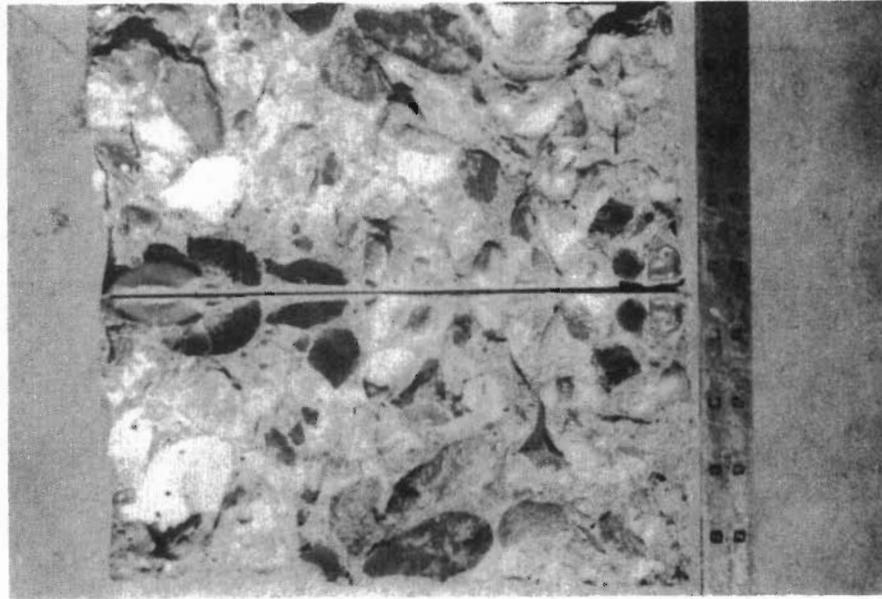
Close-up of typical fracture plane of splitting tensile test specimen.
